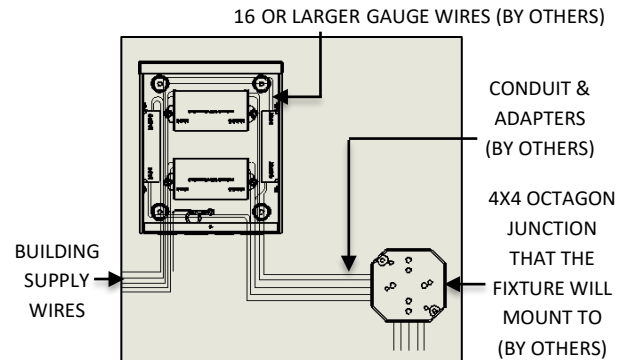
FOUR DRIVER REMOTE BOX SETUP FOR 60" & 72" SERIES
